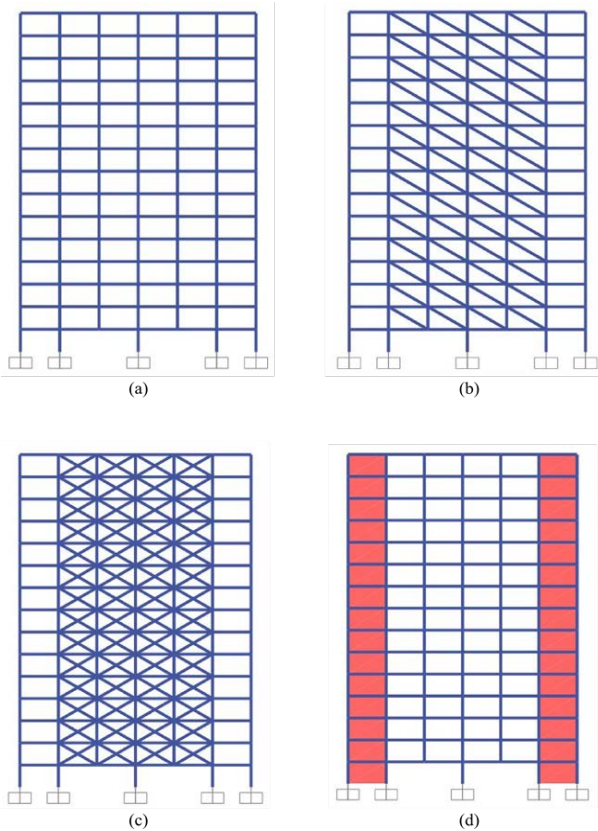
Elevation of various models of RC structure considered for the analysis (a) Regular building with floating column (Model 2) (b) Building with masonry infill modelled with equivalent struts (Model 3) (c) Building with bracings (Model 4) (d) Building with shear walls (Model 5)
